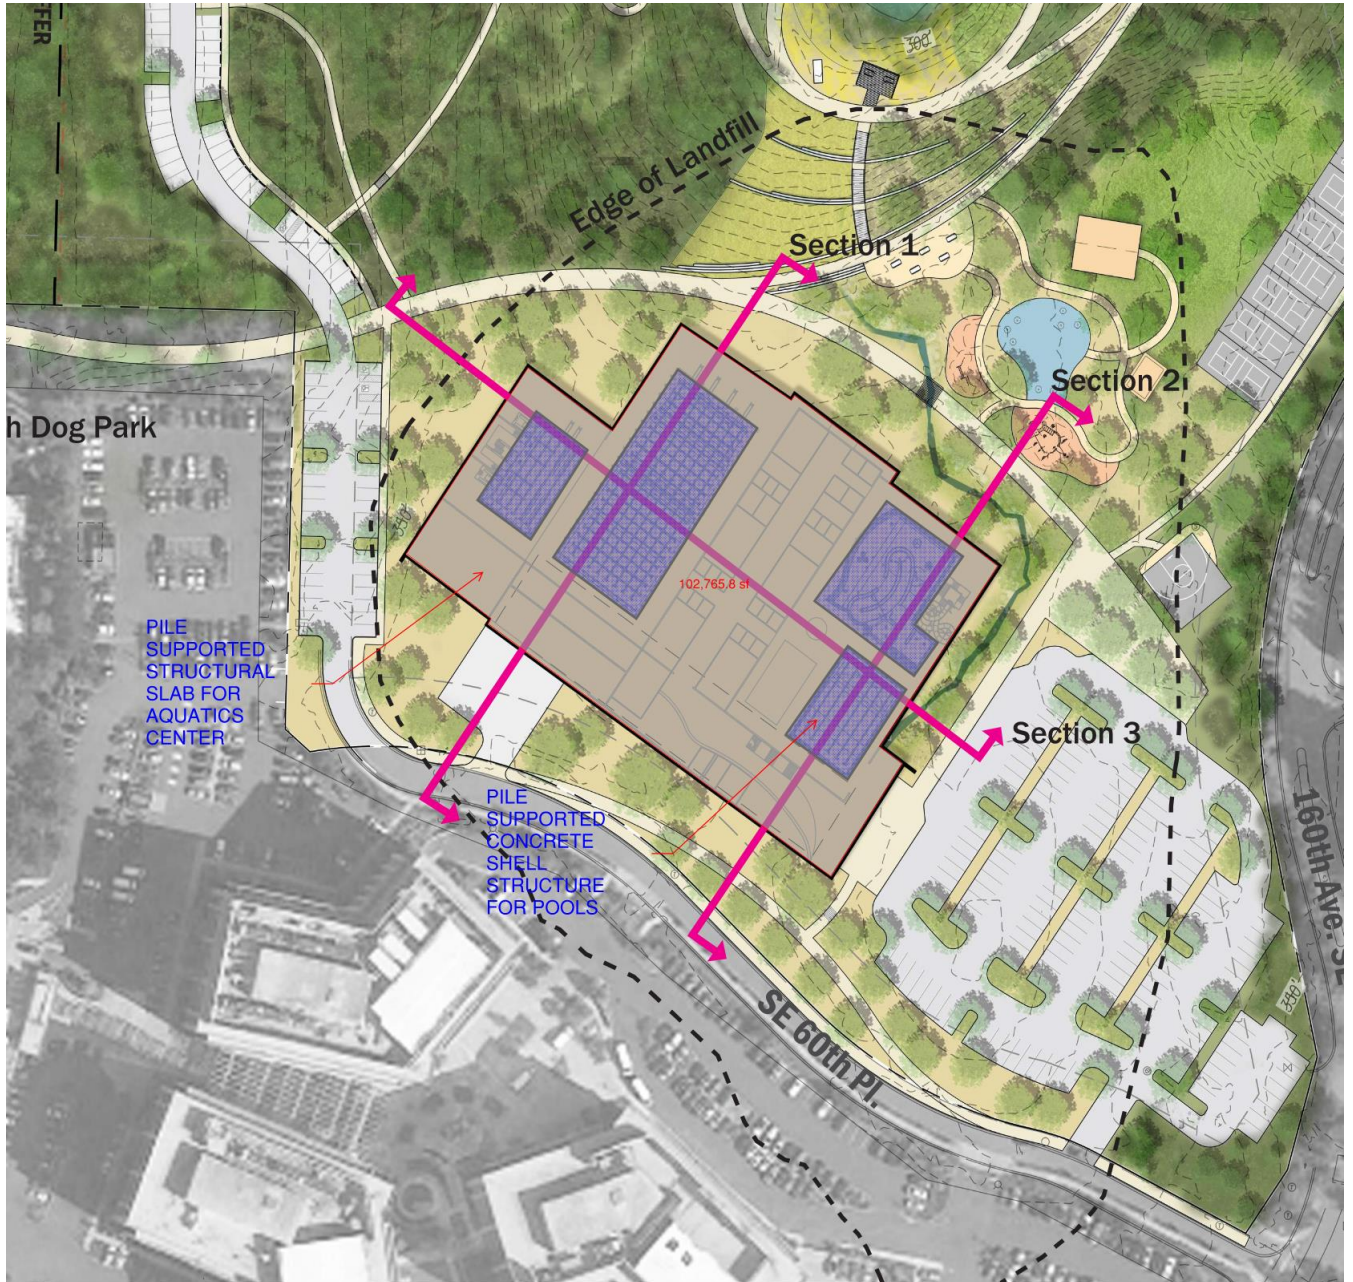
AQUATIC CENTER OVERALL PLAN – CONCEPT #2
